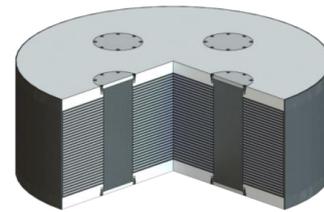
Concept of Multi-lead Rubber Bearing (MLRB)
